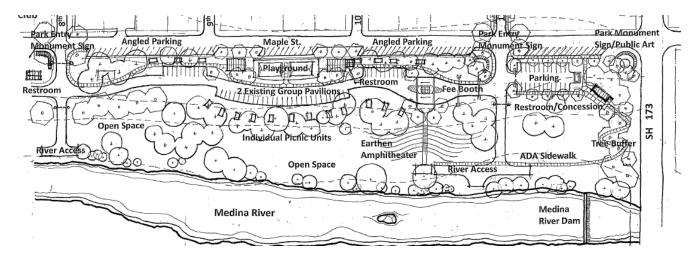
A: 2014 Bandera Parks Plan, Phase 1 Rendering
